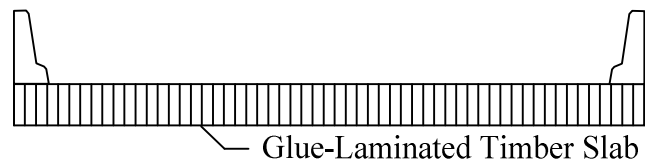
GLUE-LAMINATED TIMBER SLAB
